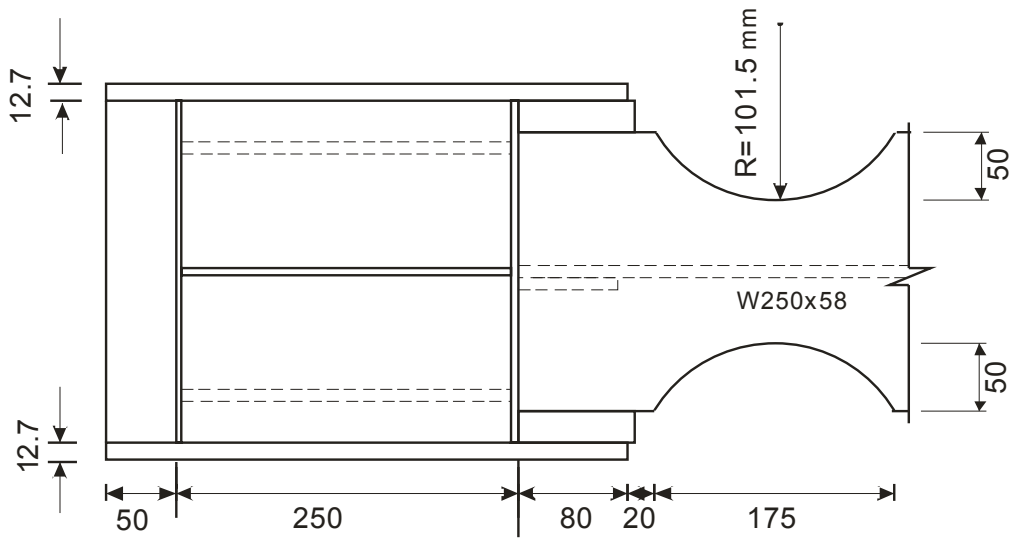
Detail of the first floor frame connection in the RBS specimen
